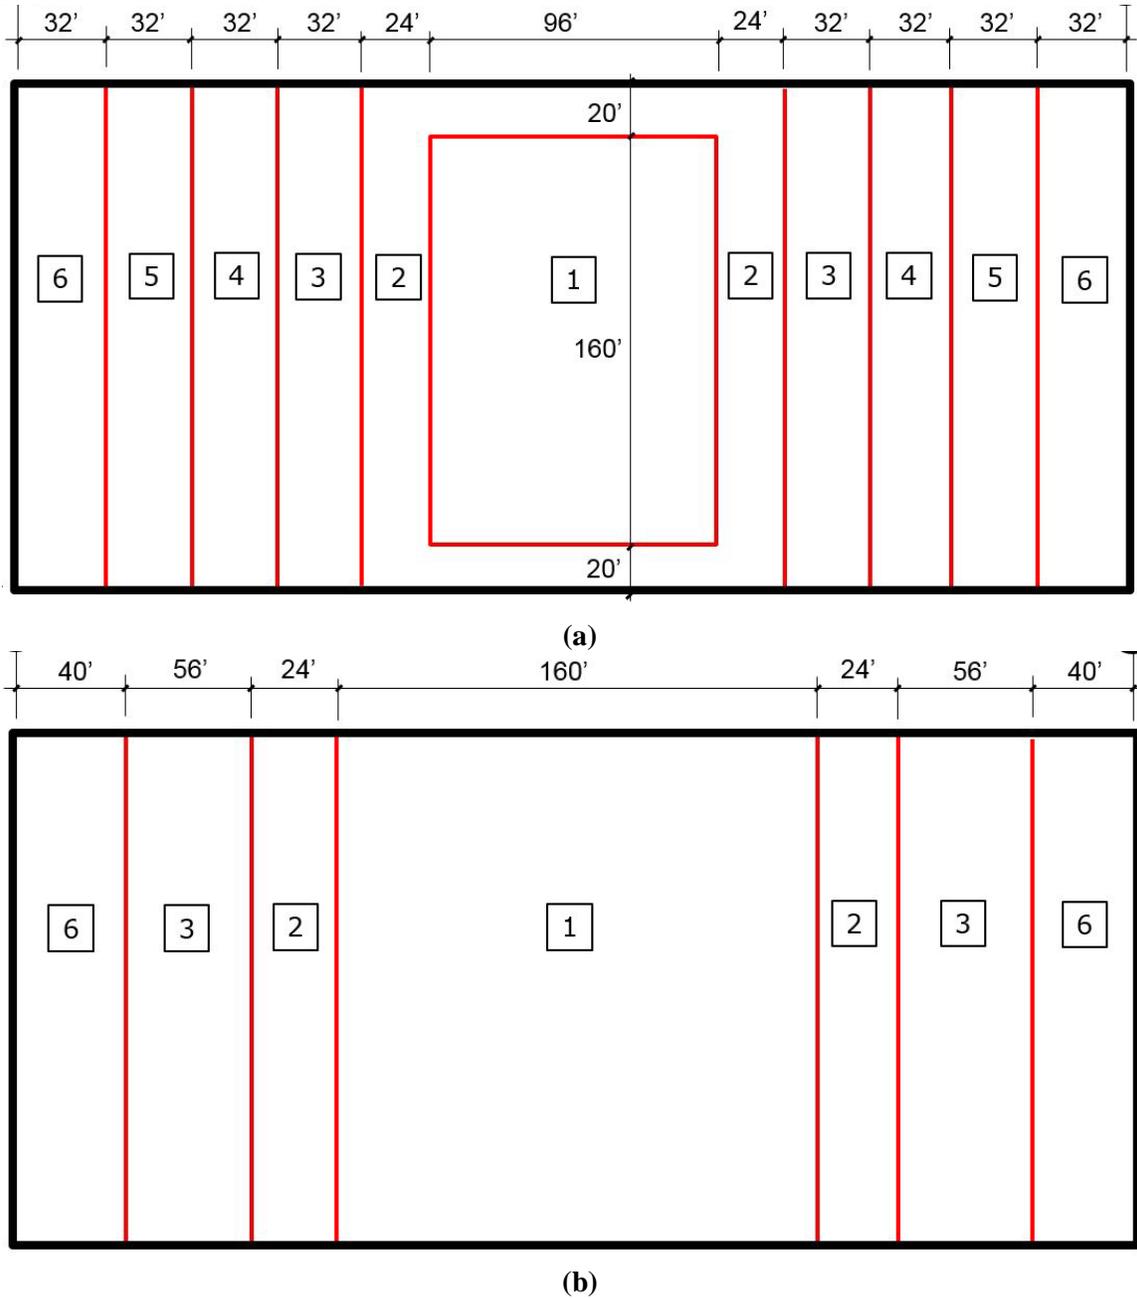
Roof diaphragm nailing details for: (a) existing/conventional design of RWFD buildings and (b) design applying the distributed yielding concept (1ft=0.3048m)
